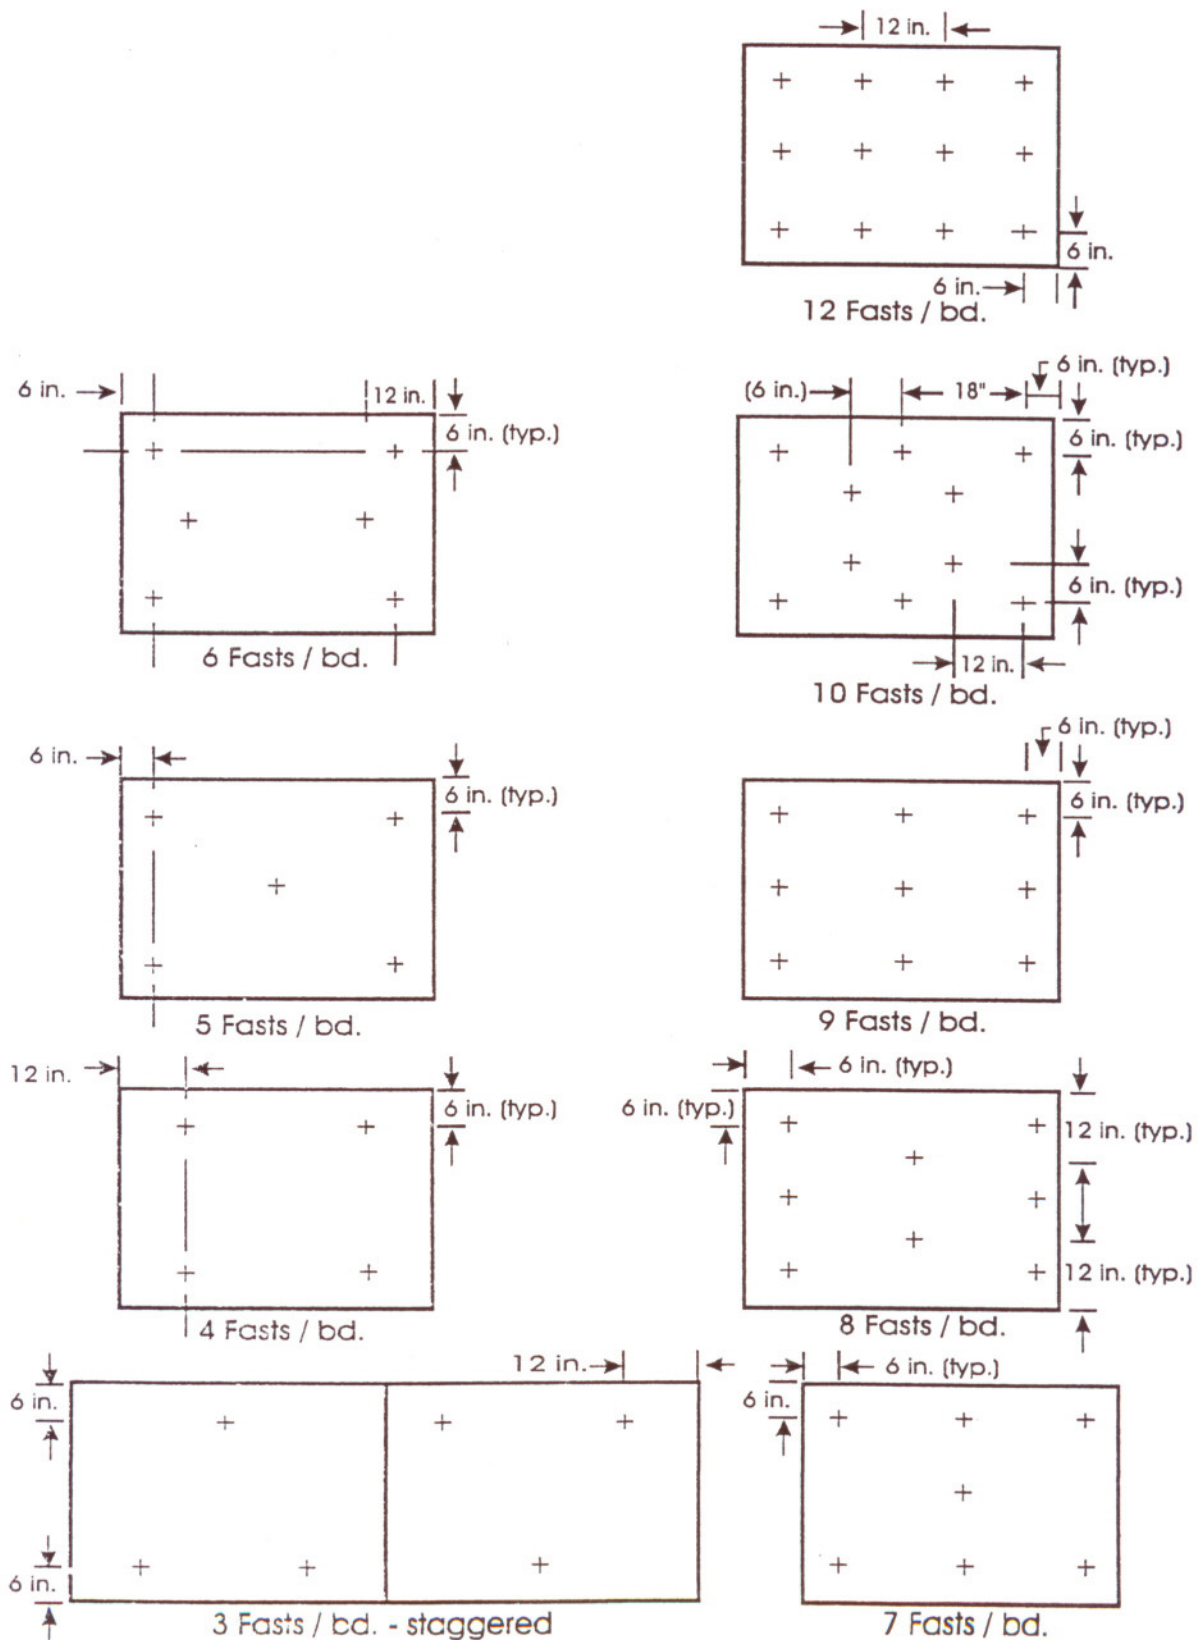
Fastener placement 3 x 4 ft (0.9 x 1.2 m) boards.
